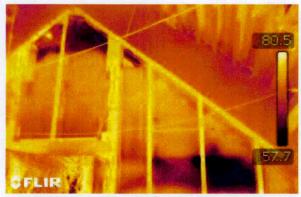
Thermographic image from inside the attic shows cold air infiltration at the gable wall transition to the roof ridge.
